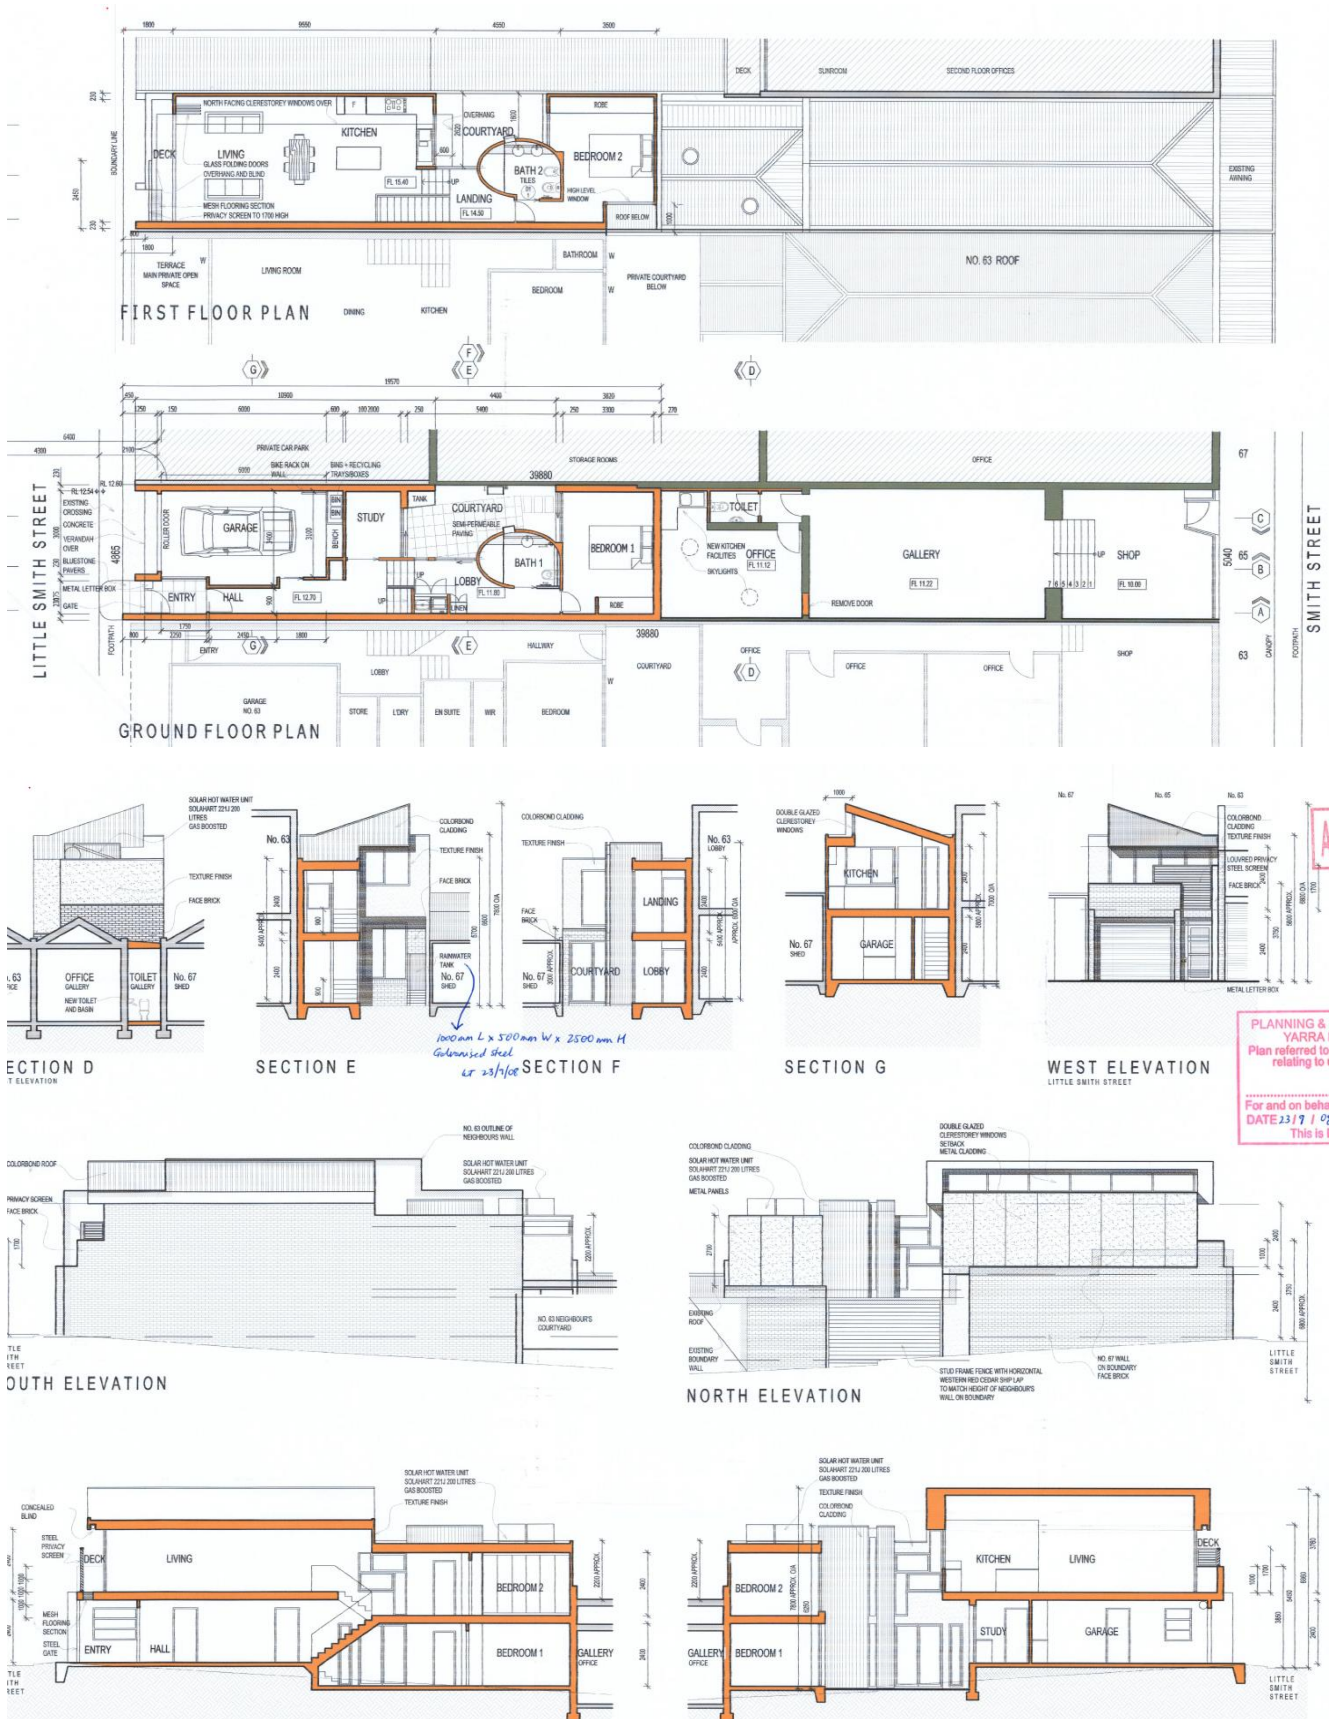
PL08/0244 No.42 Little Smith Street and No.65 Smith Street
